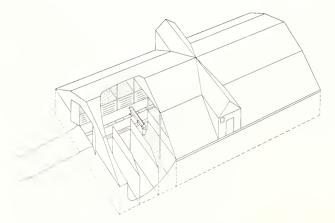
Flat belt conveyor and canvas chute filling bin.
